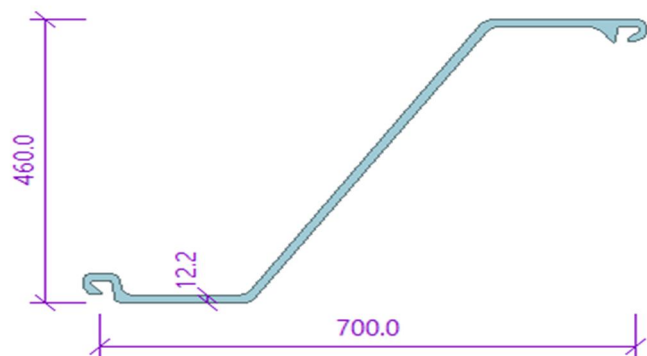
Z-section (AZ26-700) sheet pile wall
